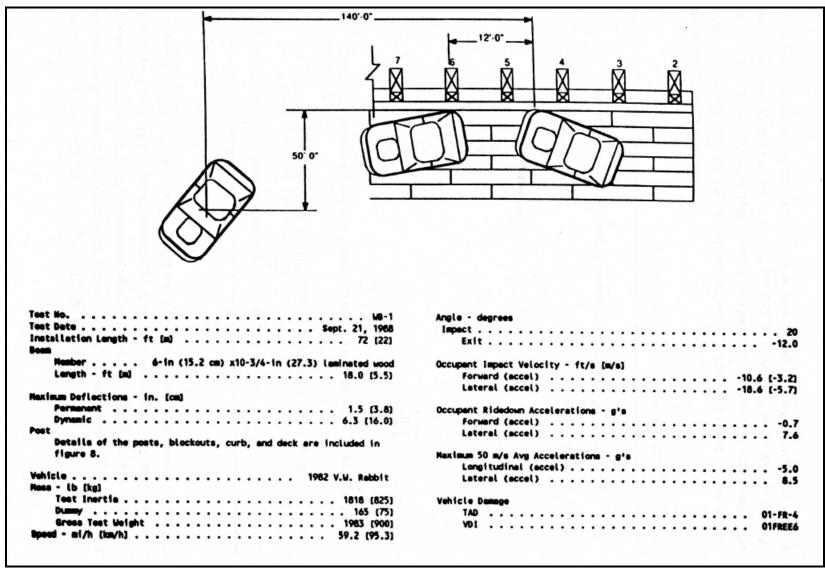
Forrest Service Glulam Bridge Rail Test 1
